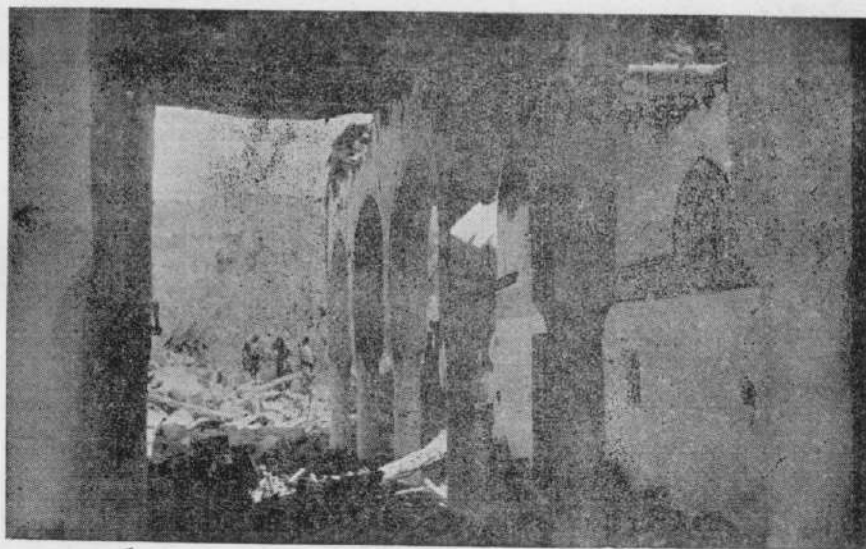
Undamaged portion of Dohran Madarsa-cum-Mosque, standing posts, arches and damage in the roof.
